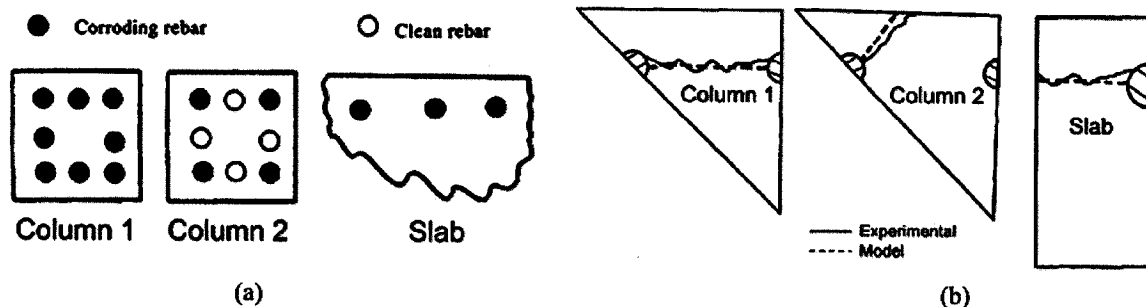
(a) Rebar uniformly corroding in a column (column 1), corner rebar uniformly corroding in a column (column 2), and all rebar uniformly corroding in a slab. (b) Experimental and finite element results. All figures extracted from [79].
